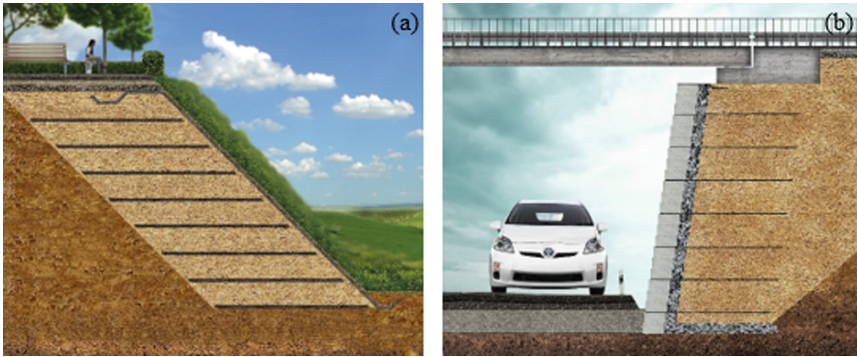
Application slope stability (a) Slope reinforcement (b) Bridge Abutment—Huesker.
